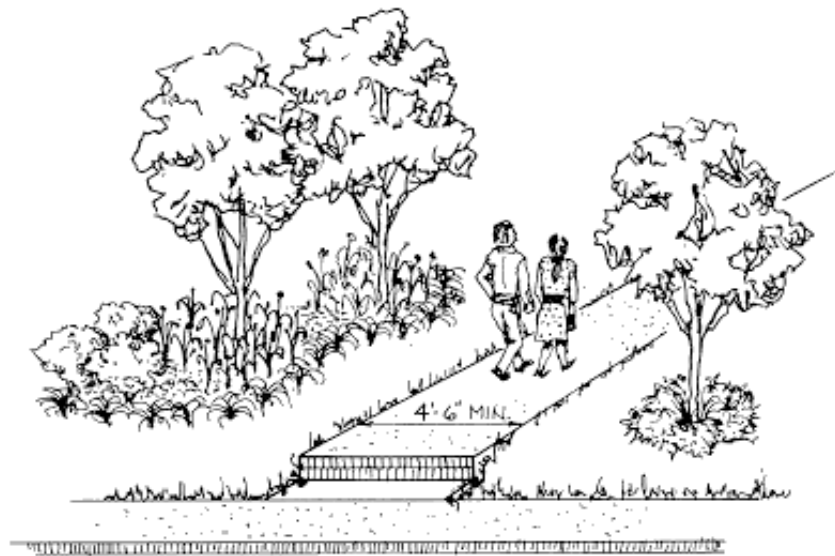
The front walk should be wide enough to allow two people to walk side by side.
